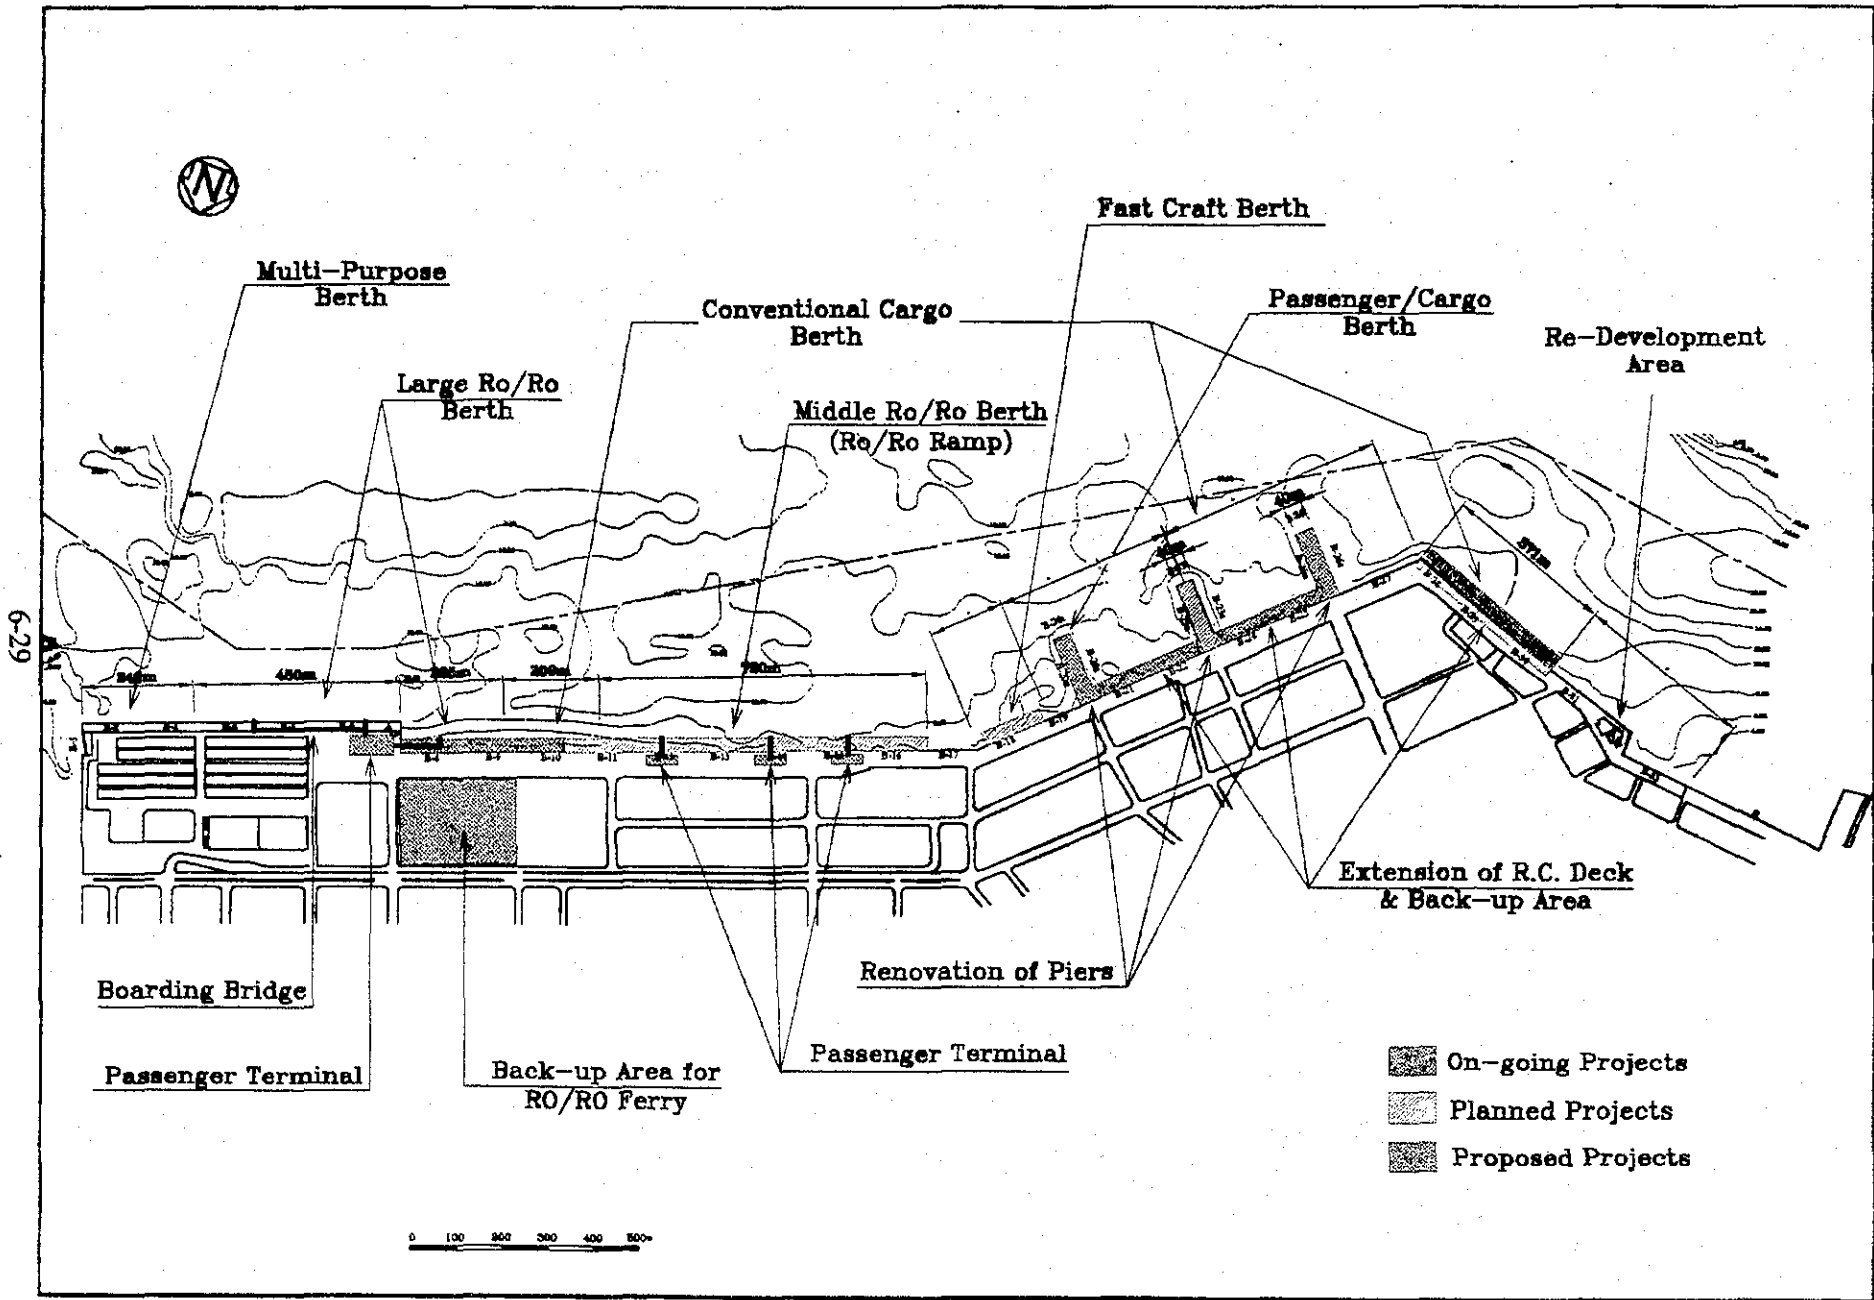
Cebu Baeport Development Plan (2020)
